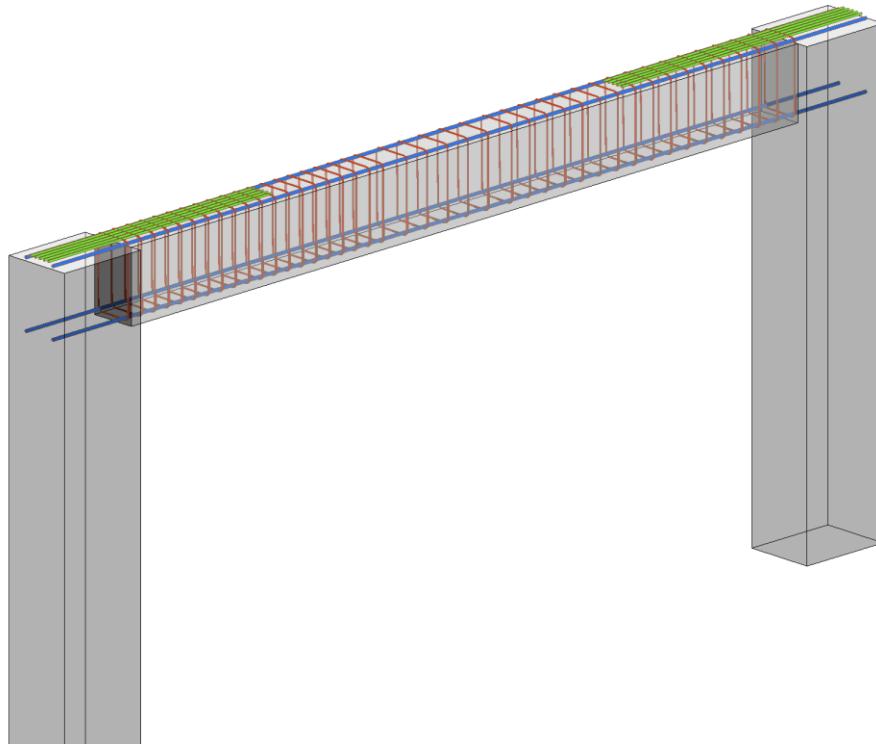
STEP 4 REVIT BEAM REINFORCEMENT
